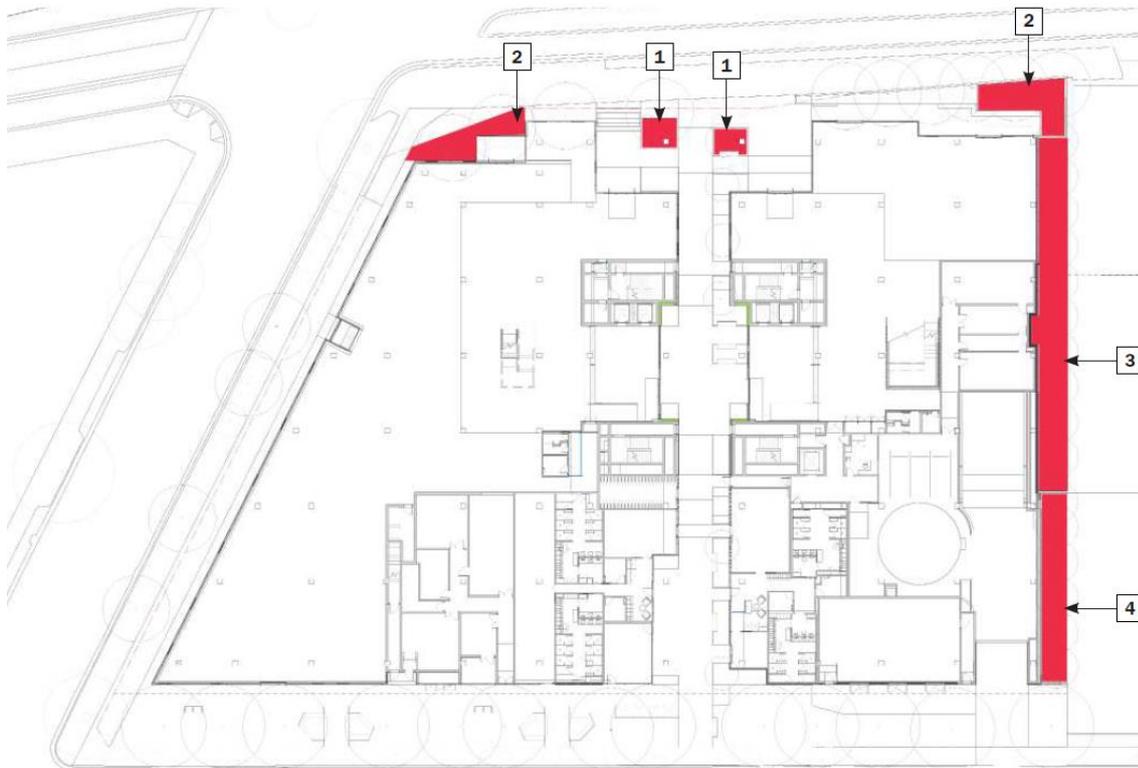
Proposed deep soil area (shaded red) of the concurrent detailed DA - D/2021/529
